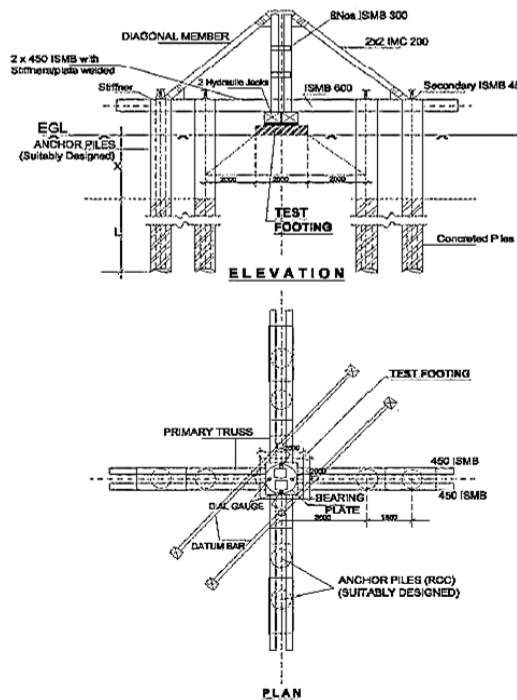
Schematic Sketch of Footing Load Test Arrangement
